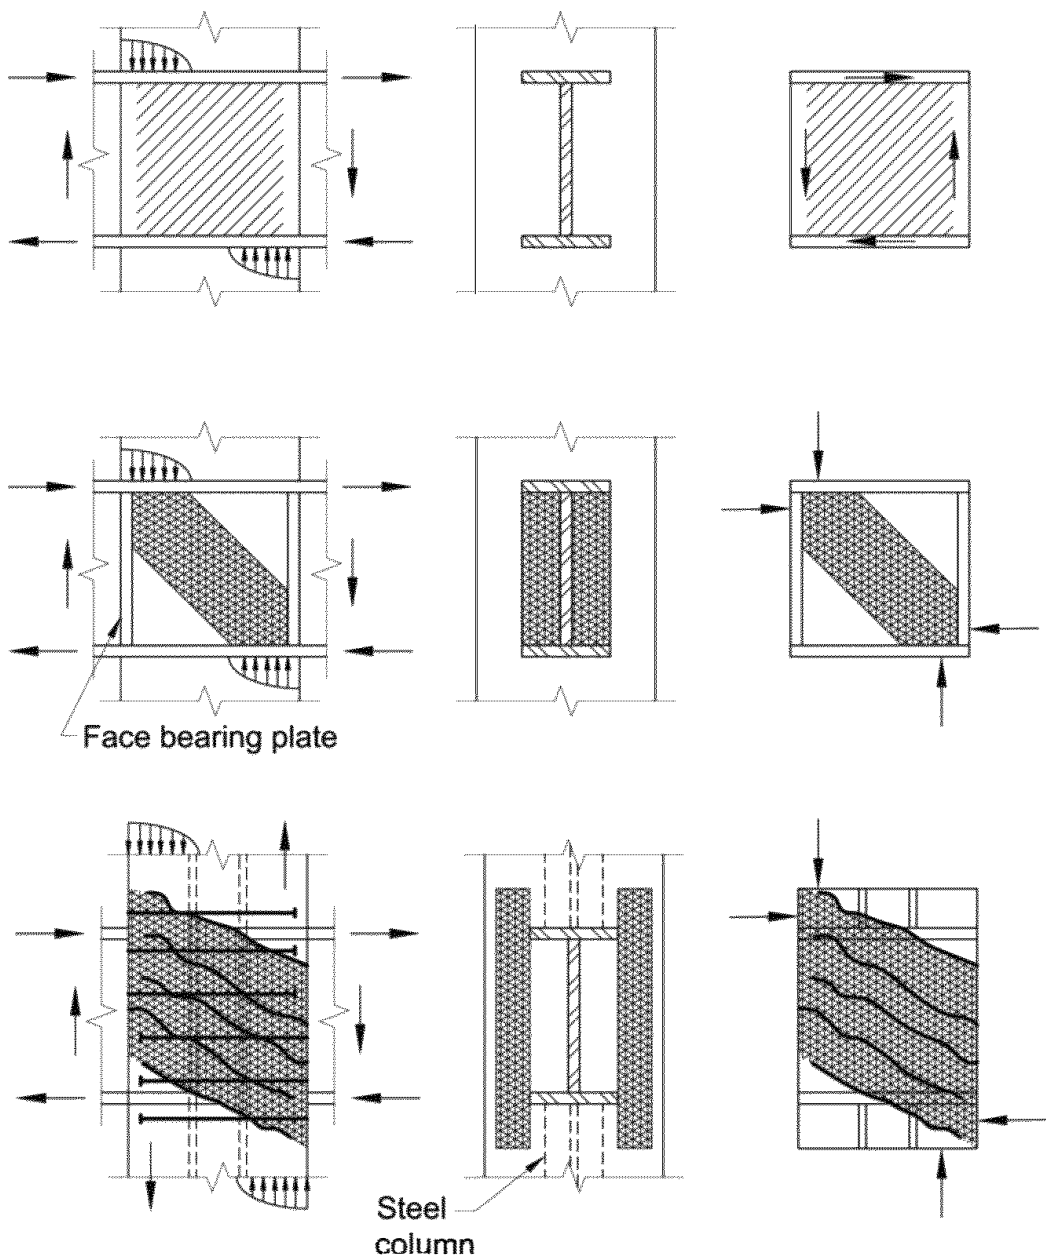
Panel shear mechanisms in steel beam-to-reinforced concrete column connections (Deierlein et al., 1989).
